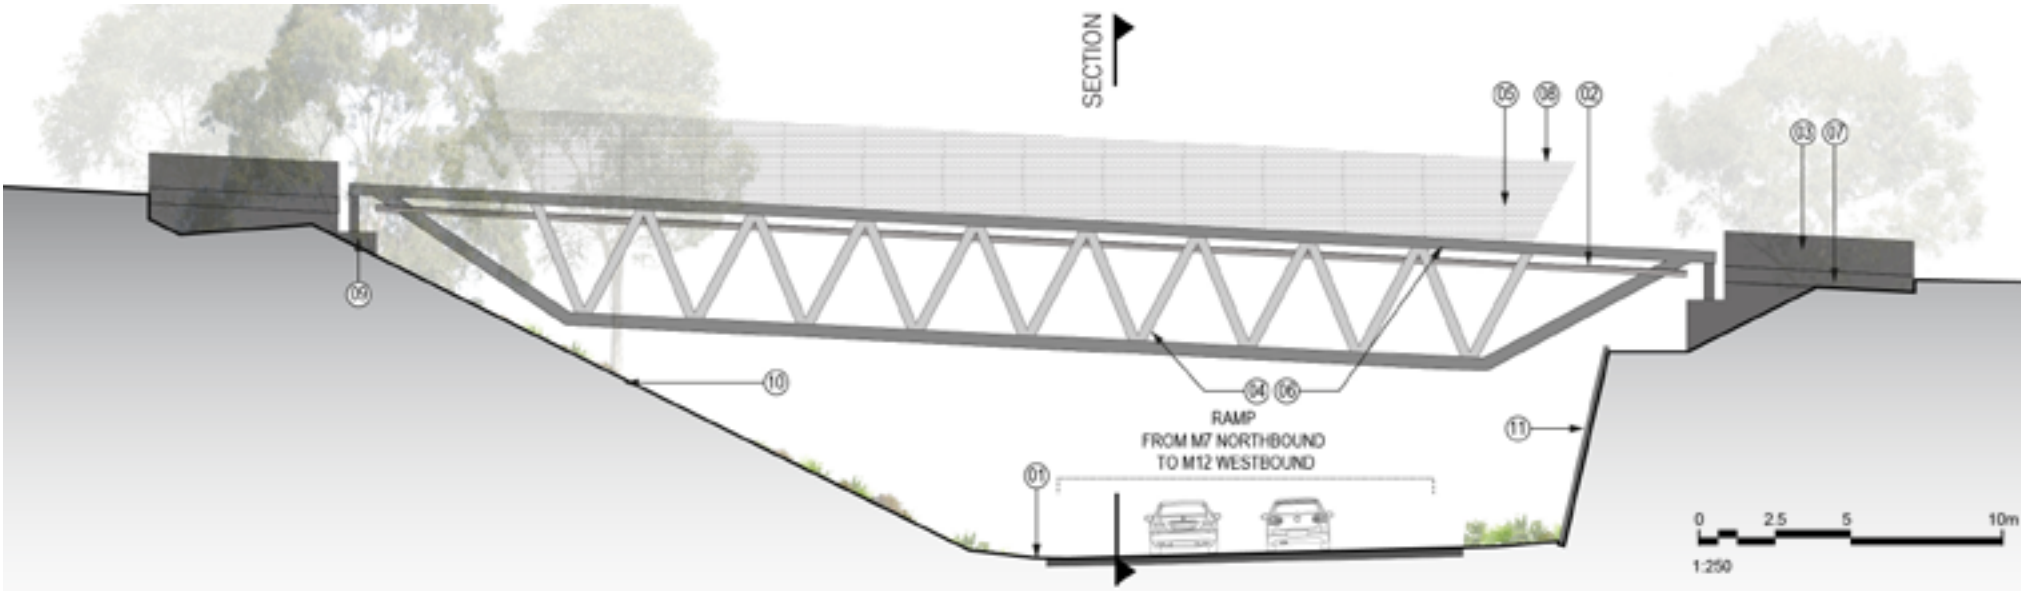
Elevation - BR16 - Shared user path bridge over M7 Northbound exit ramp
